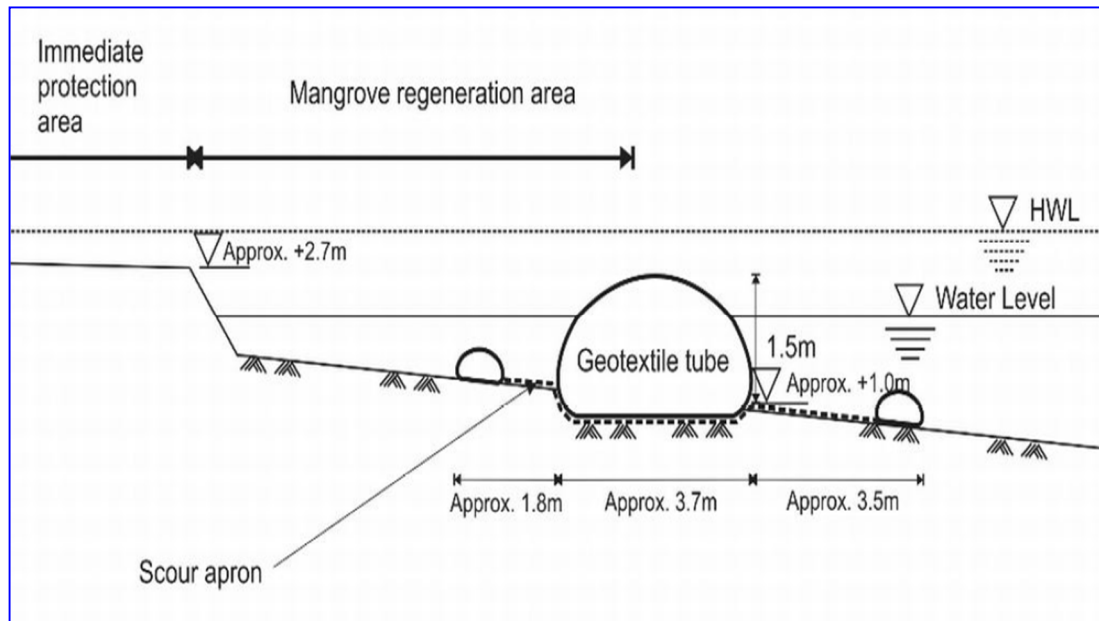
Schematic diagram of Tanjung Piai geotextile tube breakwaters (source: Tan, K.S. et al)
